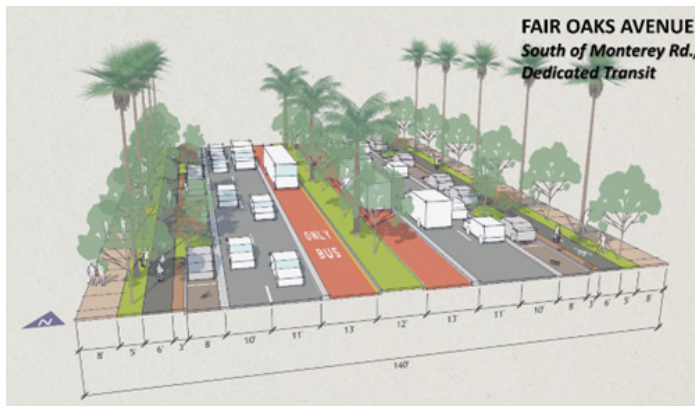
Proposed alternative street section for Fair Oaks Avenue south of Monterey Road
